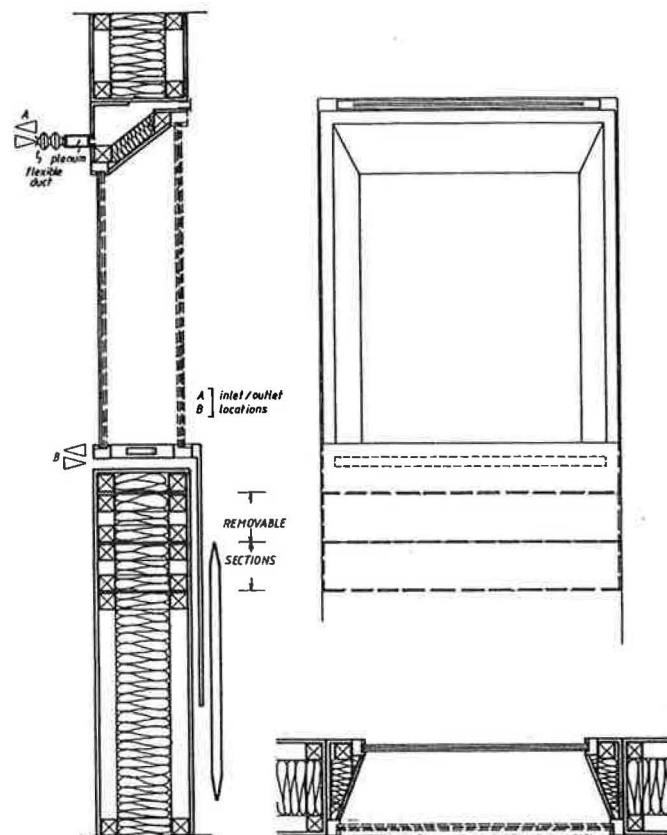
Section through separating wall showing 'splayed reveal' window and 'double' window
